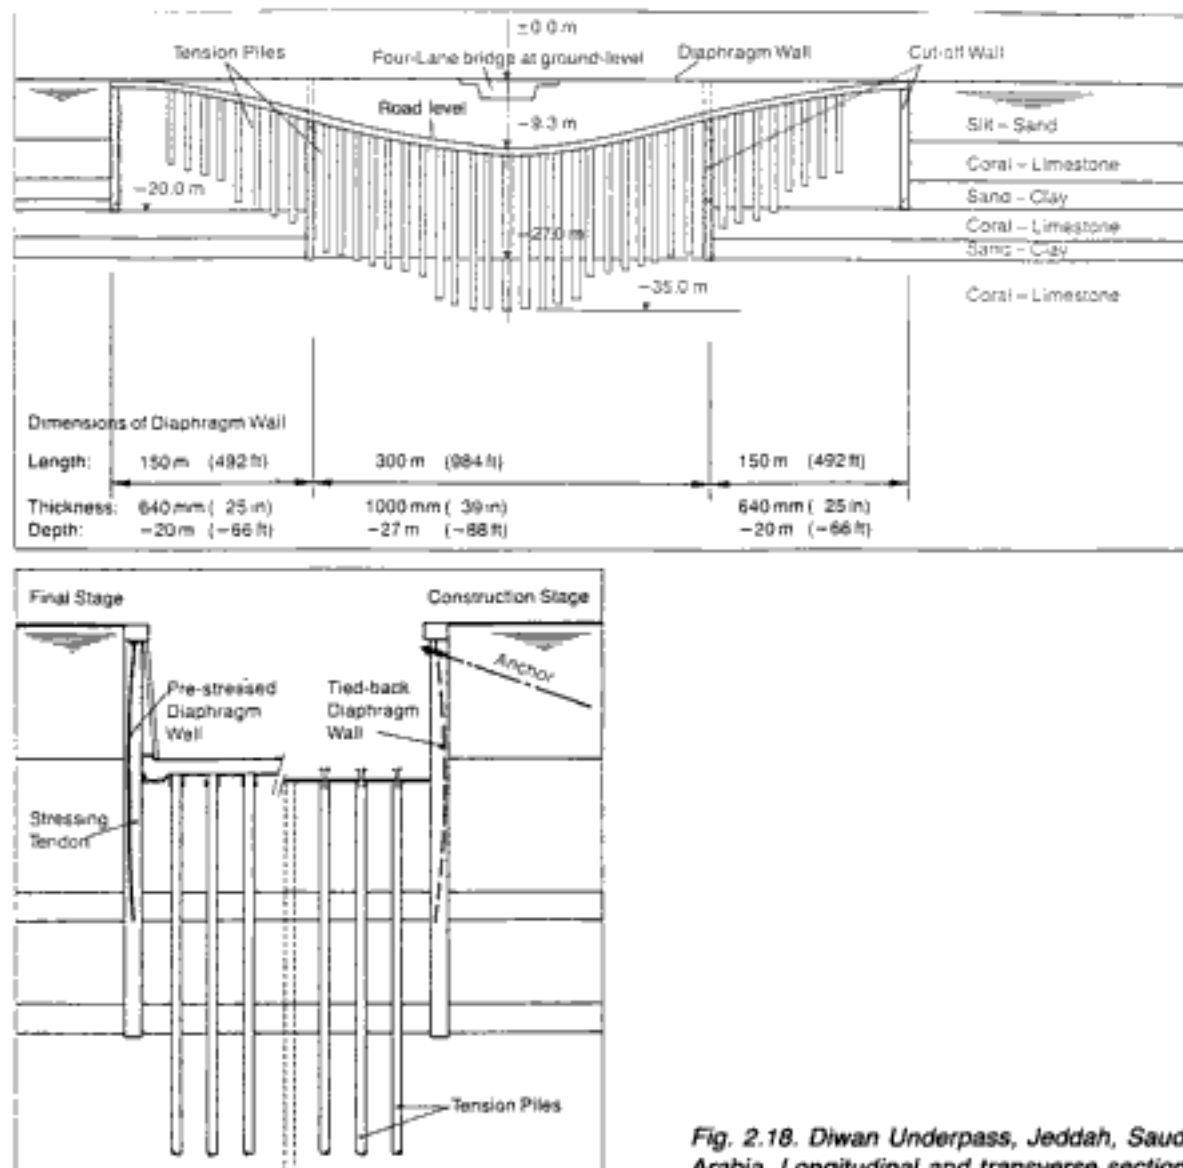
Diwan Underpass, Jeddah, Saudi Arabia. Longitudinal and transverse section.
